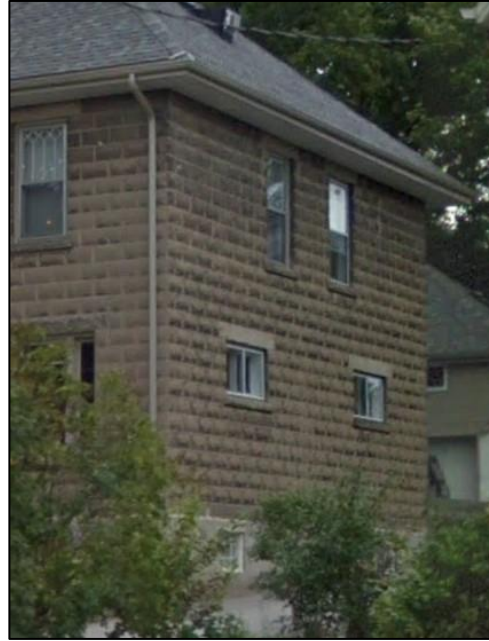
Side (southwest) elevation of the existing dwelling (Google Streetview 2020)
